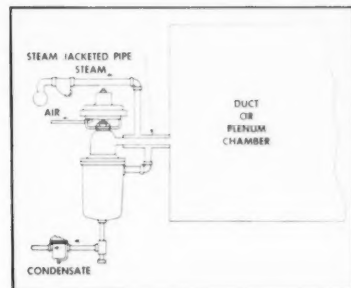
Armstrong Humidifier discharging through short length of steam-jacketed pipe. Note steam supply to humidifier should enter top of jacket and leave at the bottom.
